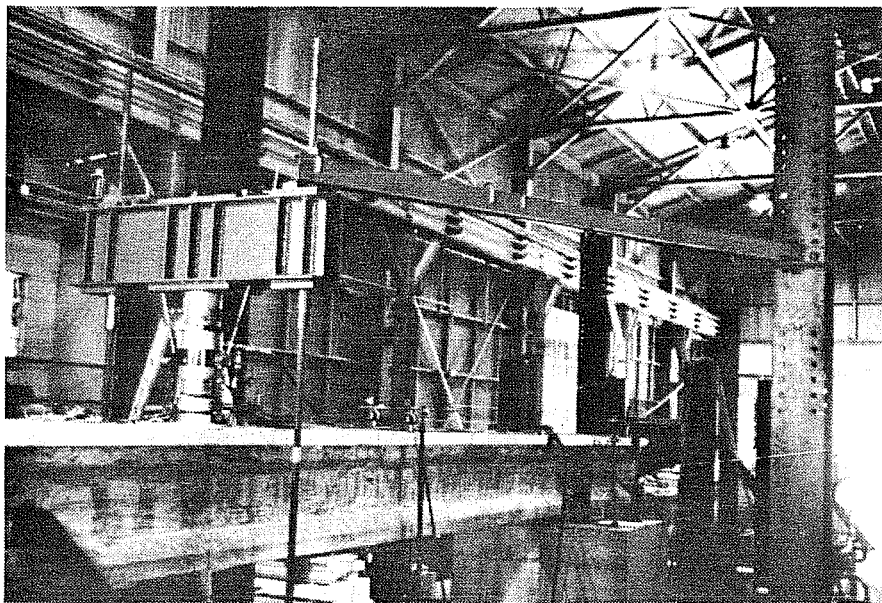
Photograph of loading system for shear tests of Specimen 1
